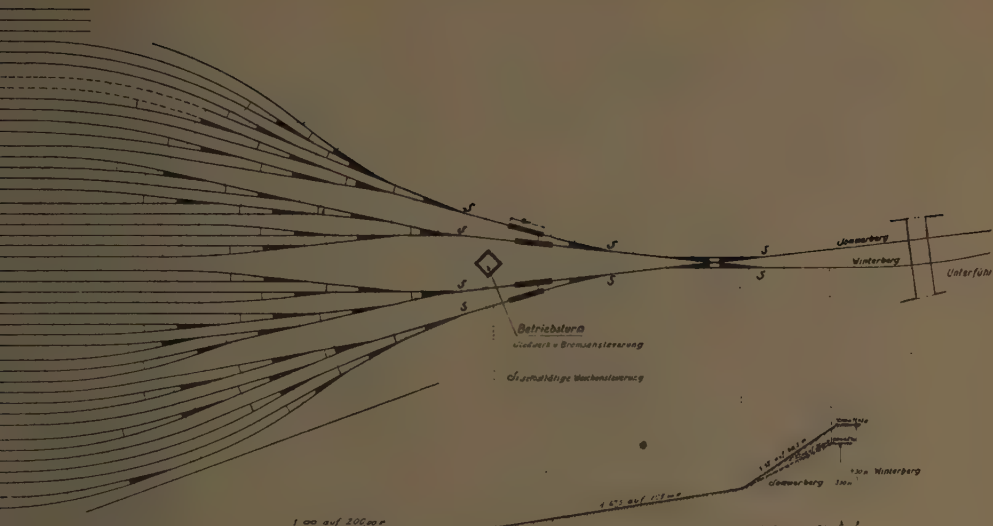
"Balloon" type sorting sidings of the marshalling yard at Bremen.
